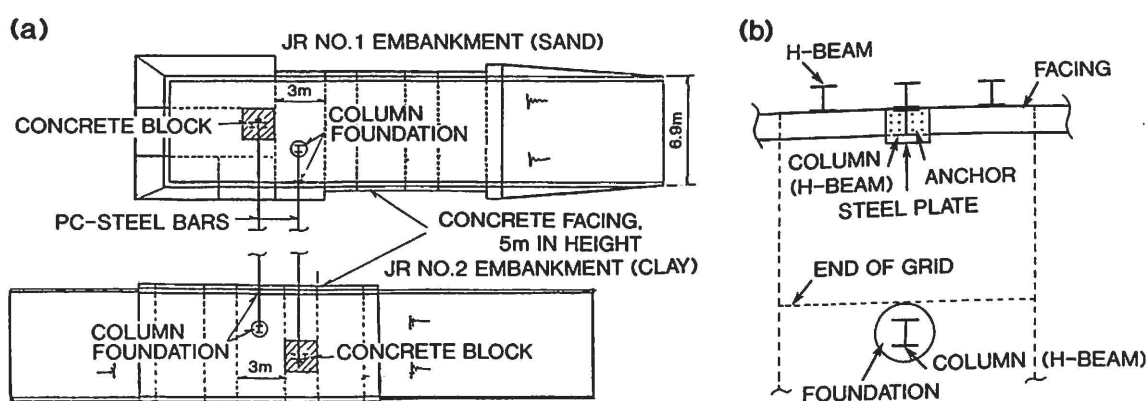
Plan of the full-scale test embankments with GRS retaining wall segments with a clay or sand backfill soil: (a) general plan, and (b) details of test zone
